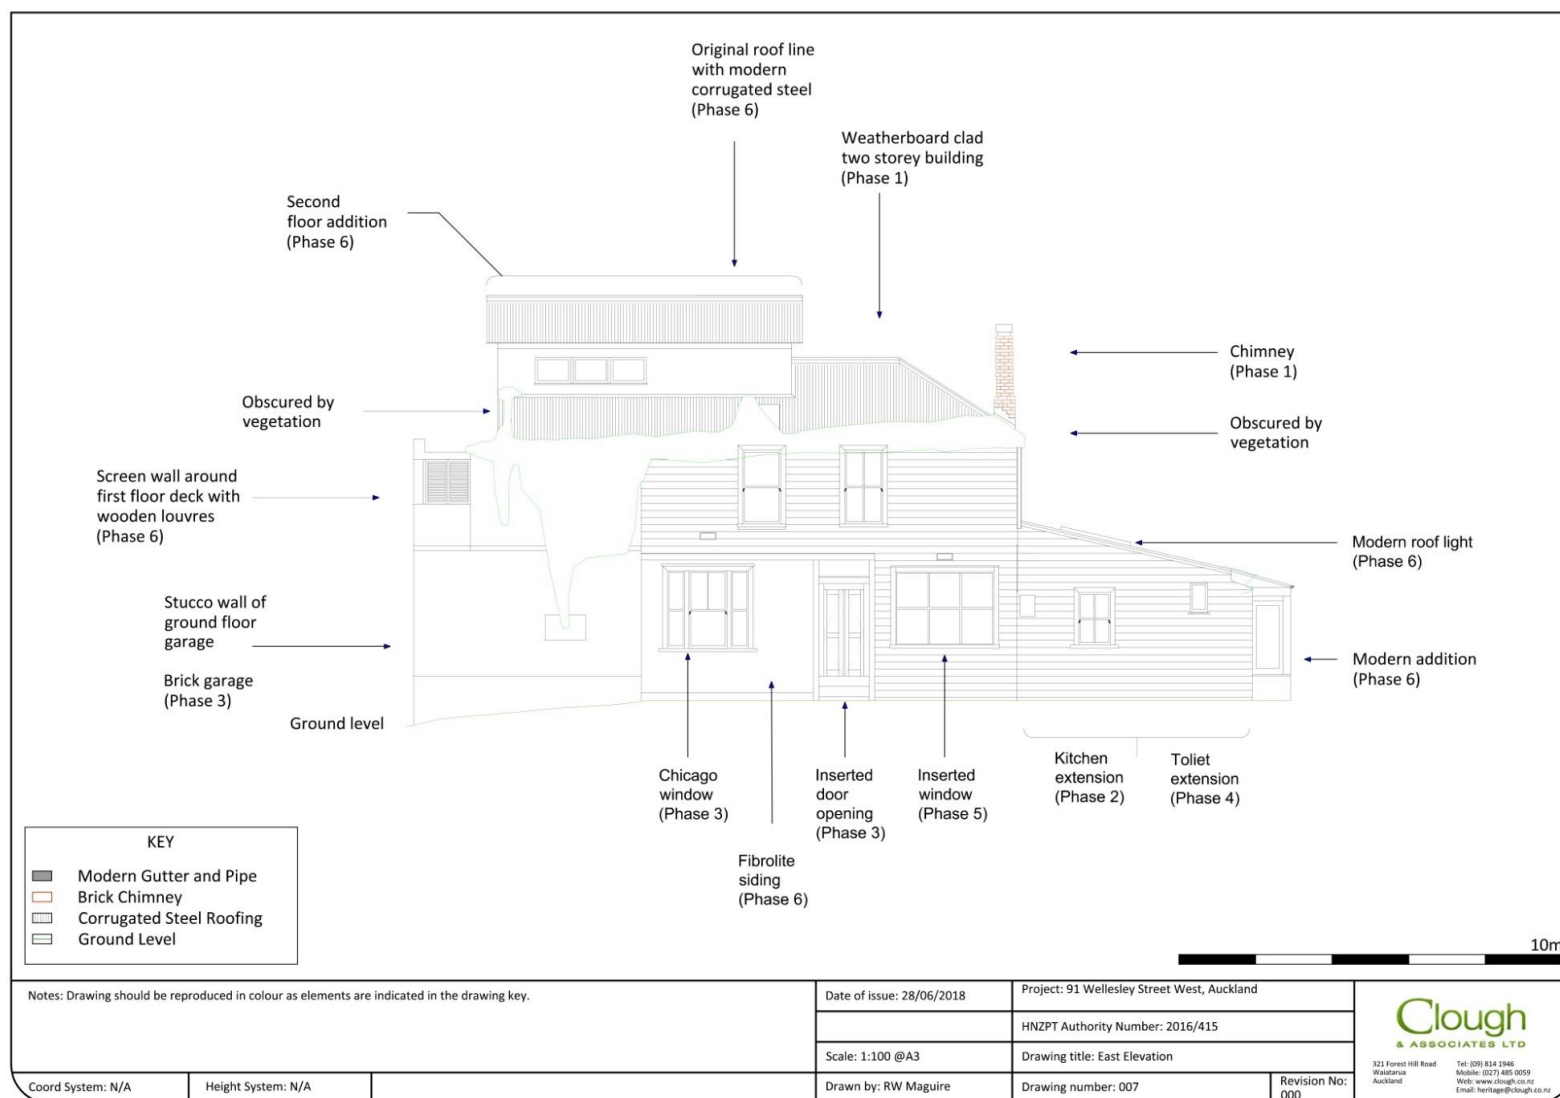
Side (east facing) elevation of 91 Wellesley Street West (source: Clough & Associates, 2015)
